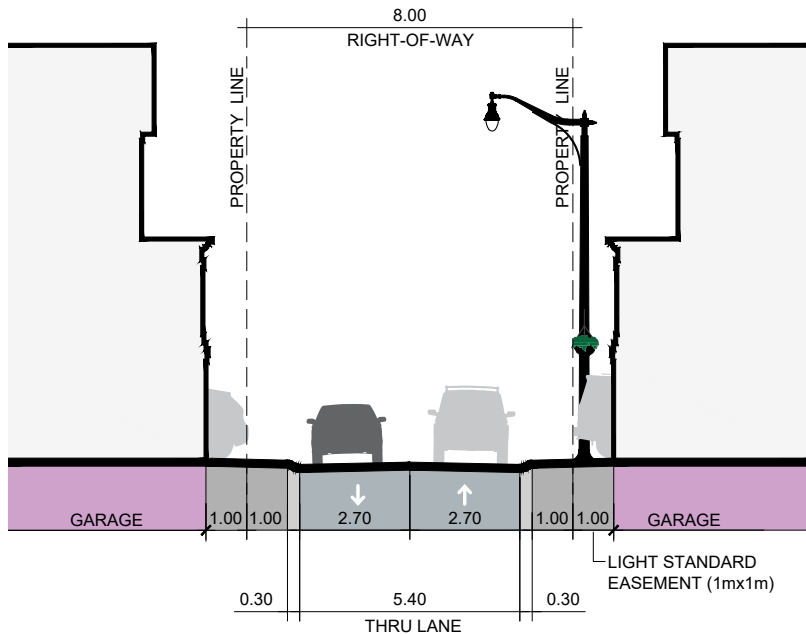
Proposed 8.0m Laneway ROW Cross Section
